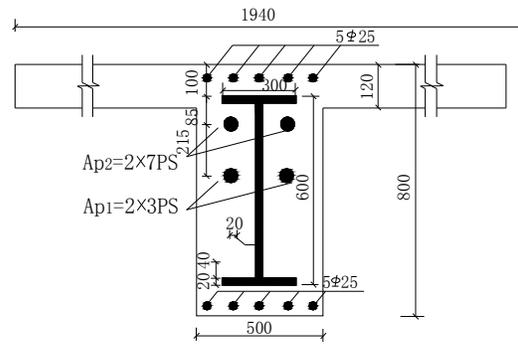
Section of encased H-shape steel prestressed concrete composite frame beams at support
